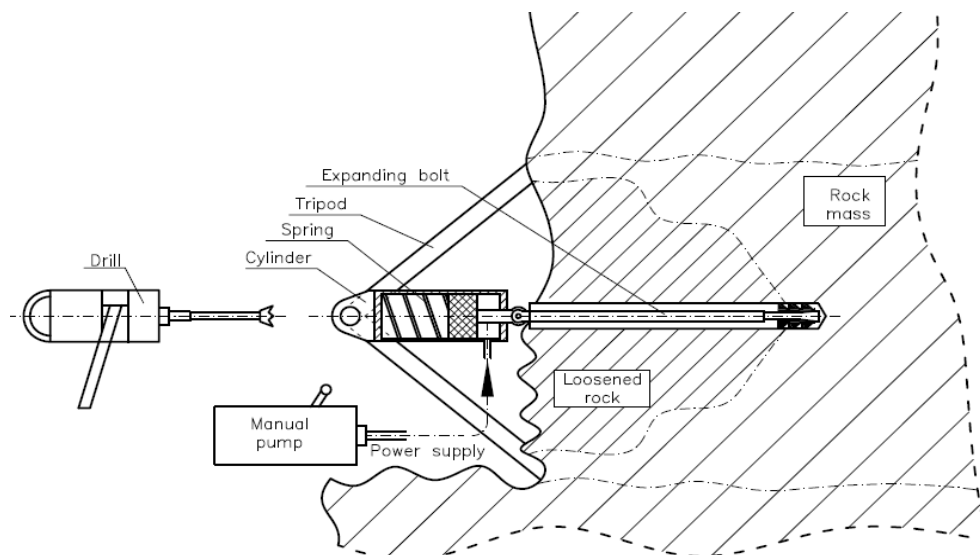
Method for mining by tearing out rock blocks by expanding bolts
